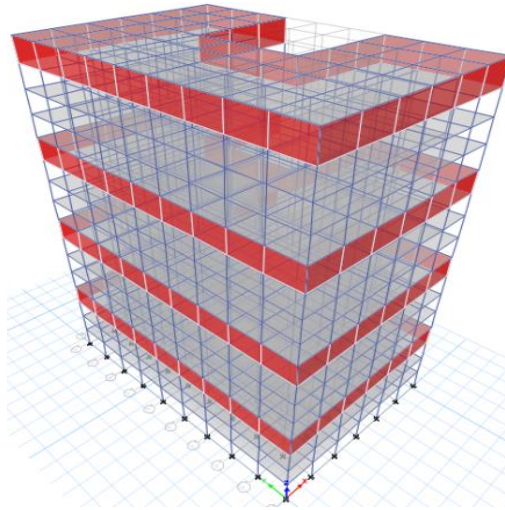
3D view of C bare Frame with Shear wall (Case 1)
